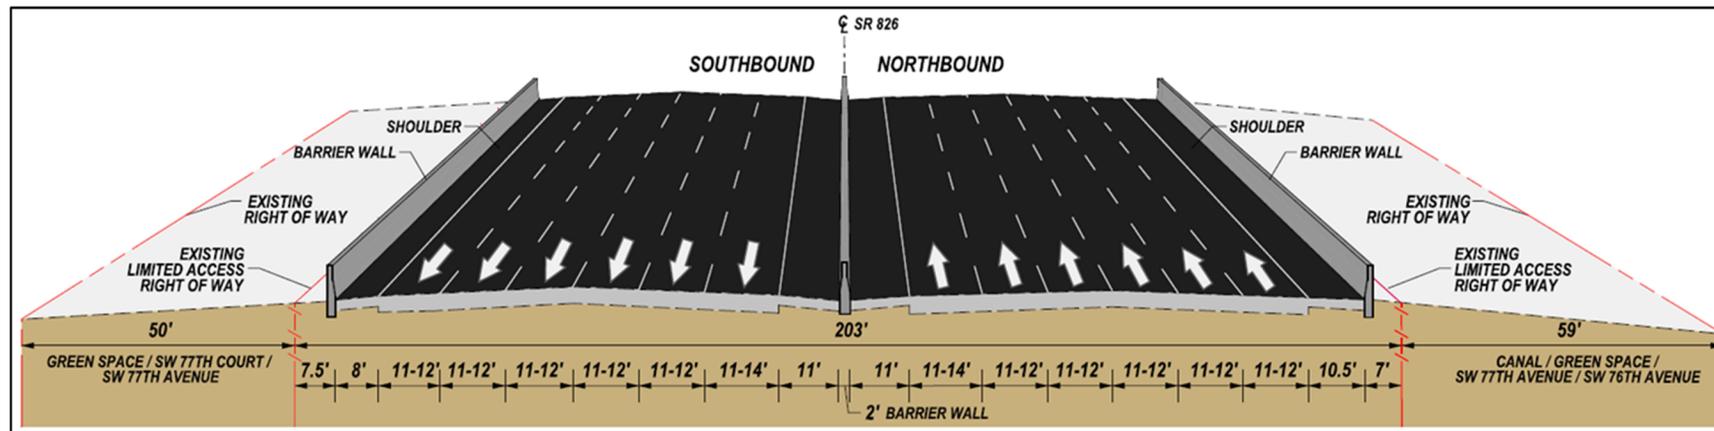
Existing Roadway Typical Section between SR 874 and SR 836
